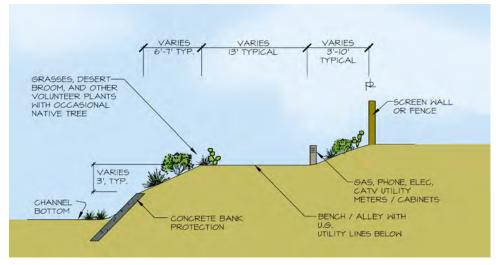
B: Existing Channel Bank Condition - East Bank between Escalante Road and Stella Road
